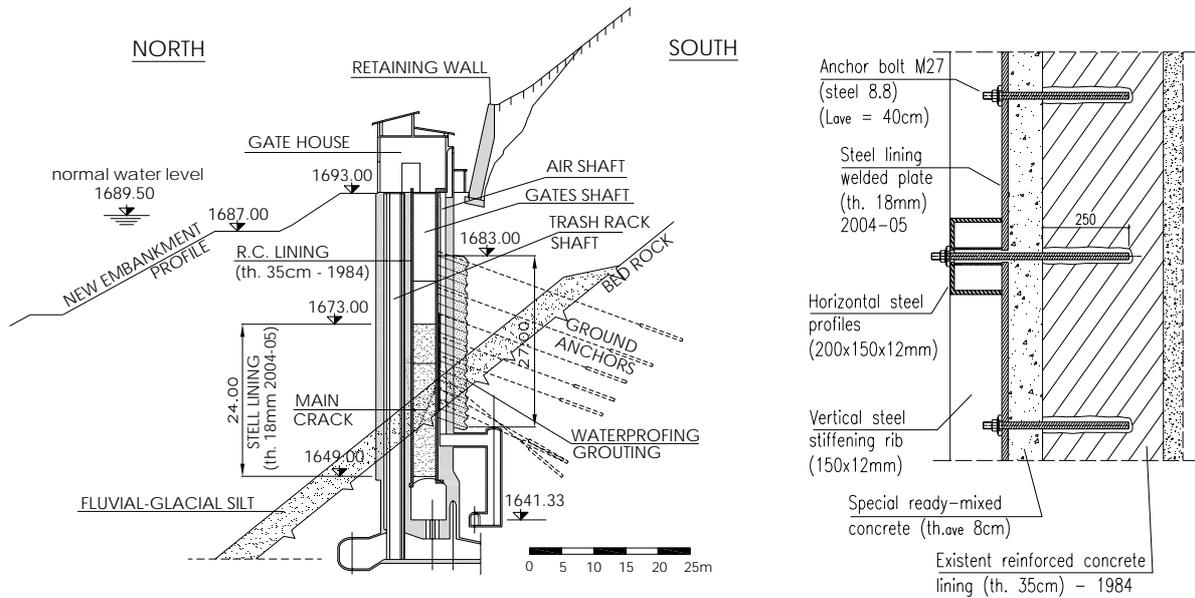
Operation shaft – Vertical section and steel lining detail
